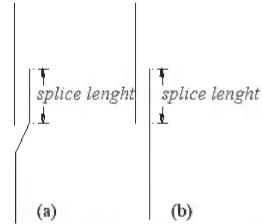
(a) Center lines of the bars coincides; (b) bars are spliced out of line
